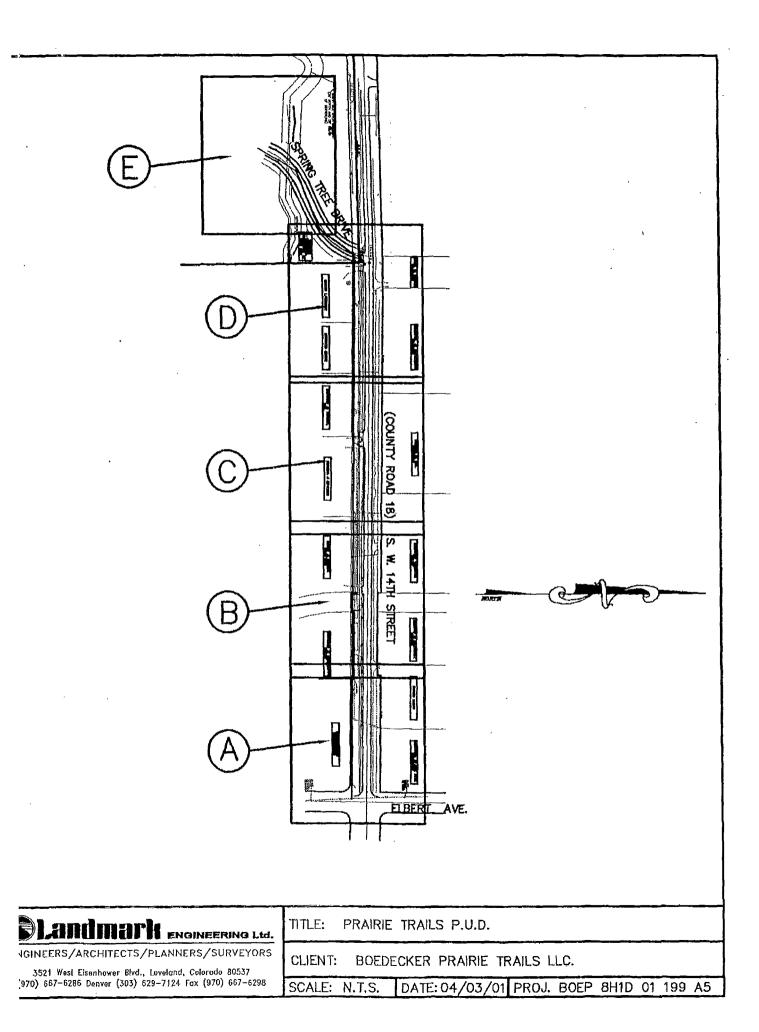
EXHIBIT "B" - CONSTRUCTION PLAN EXTRACT
